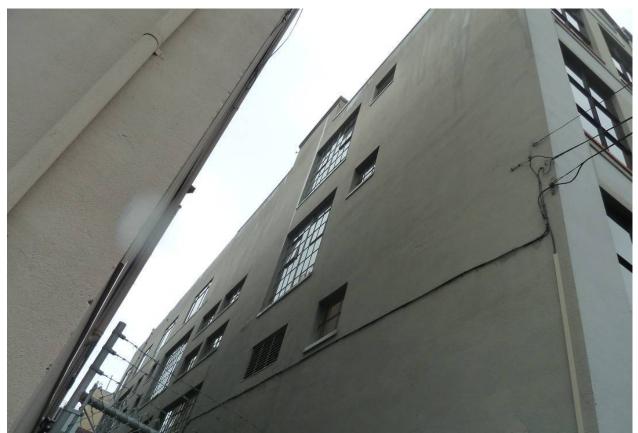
View of west elevation, where new exterior shearwall is proposed (Architectural Resources Group, January 2013).
